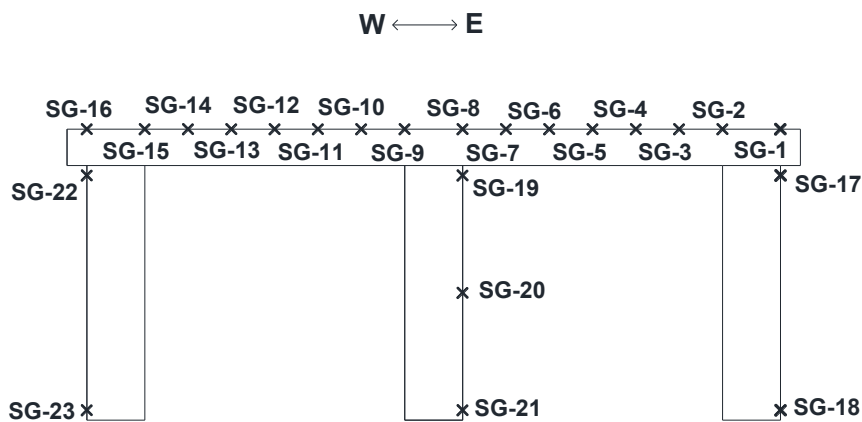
Strain Gauge Plan for Timber Girder Bridge
